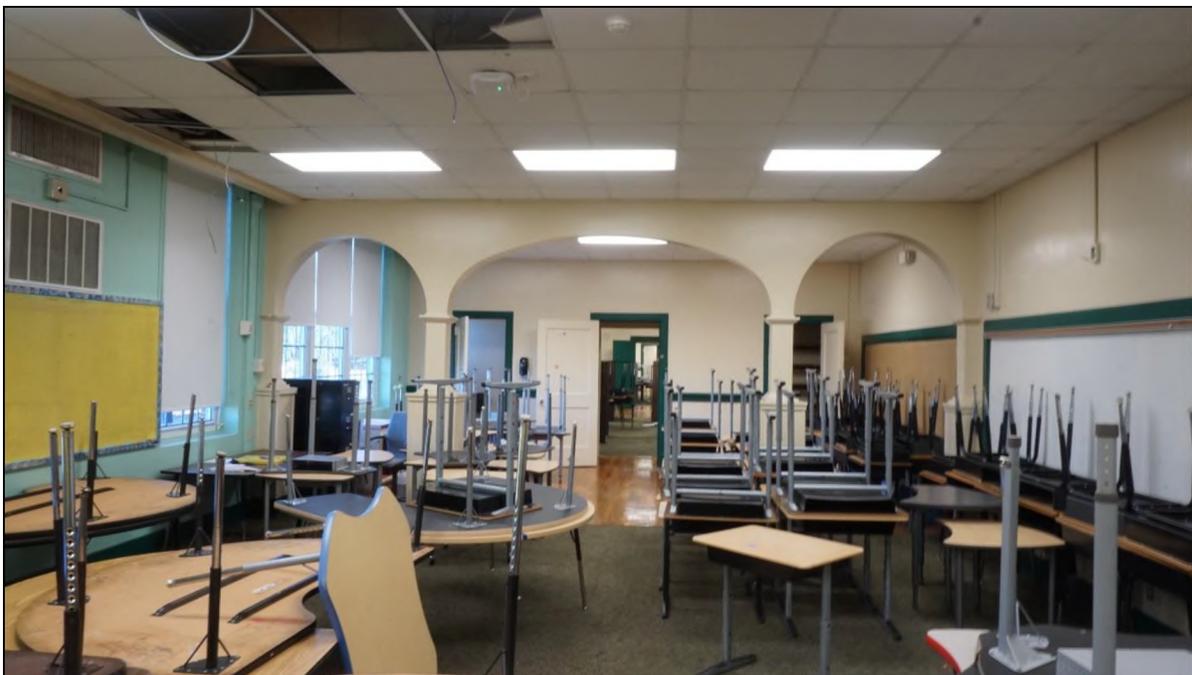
Classroom with small alcove area located on the first floor, facing southeast.
